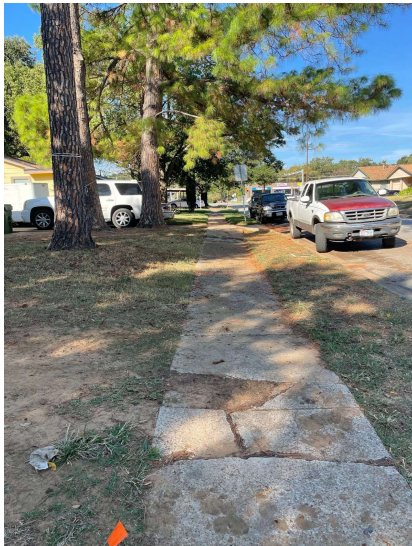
A poorly maintained sidewalk on Inwood Street near Cooper Street intersection
